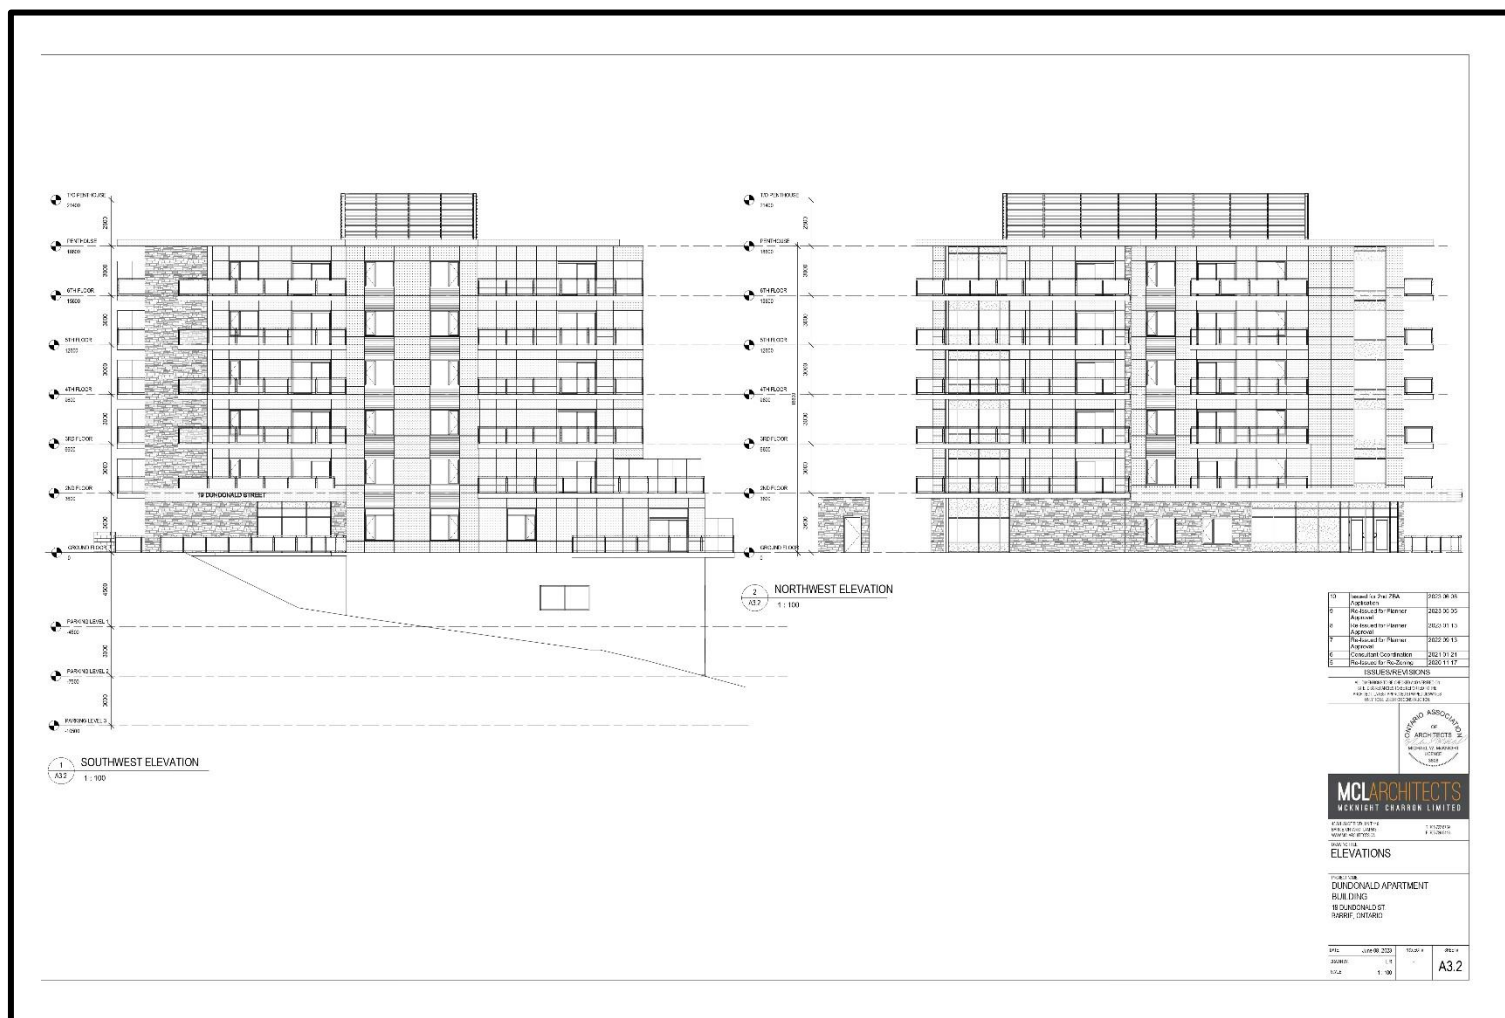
Proposed Development – Southwest and Northwest Elevations
